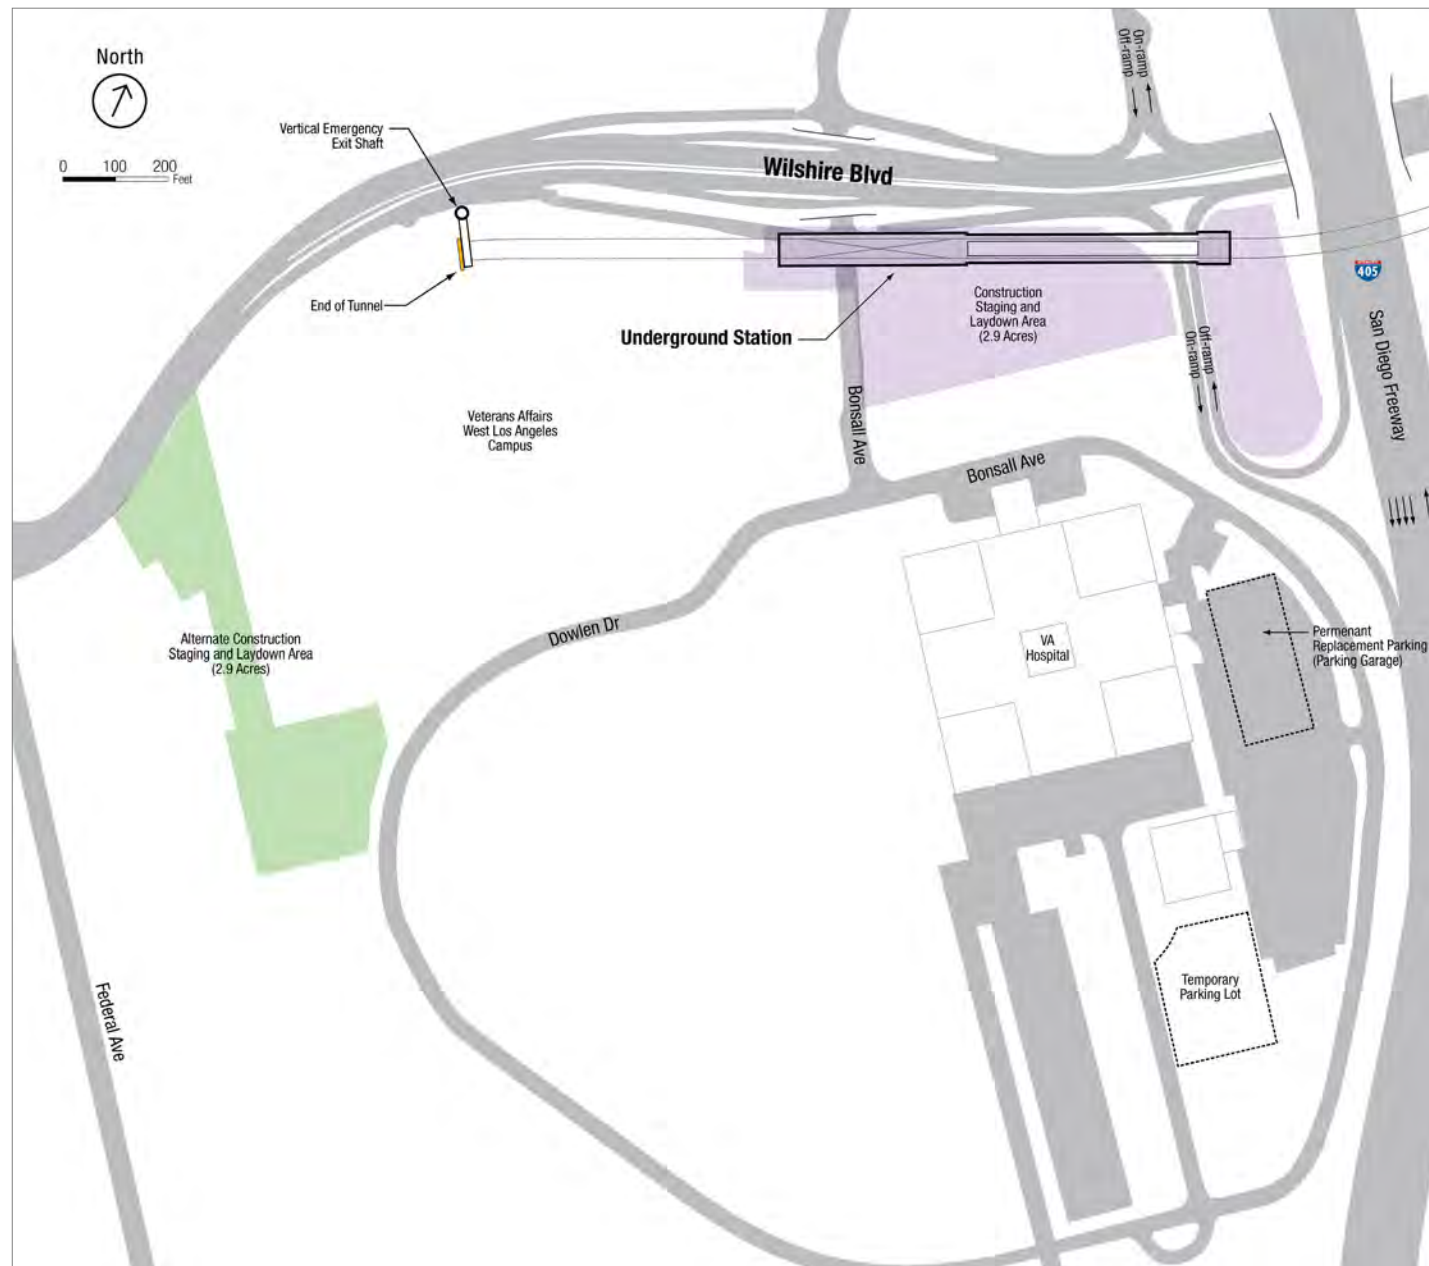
Westwood/VA Hospital South Station Area Plan
